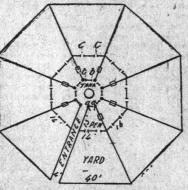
GROUND PLAN OF PIGGERY AND YARDS.
